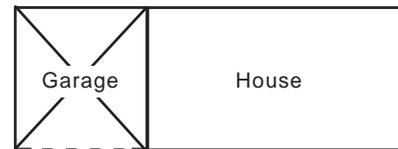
If the wall of the main house is in line with the wall containing the door of a garage with a room over it, the adjoining wall may help brace the garage.
